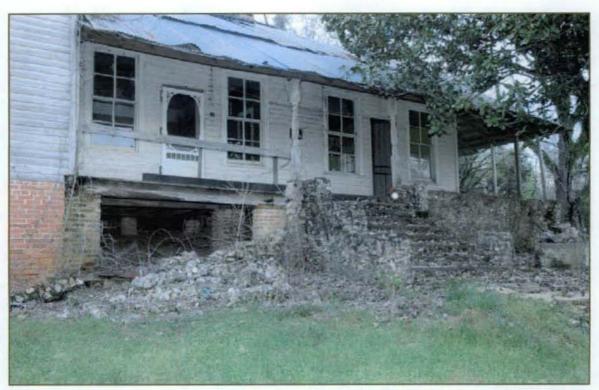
House, View #12, East Facade (Left) and North Elevation (Right), Camera Facing Southwest
